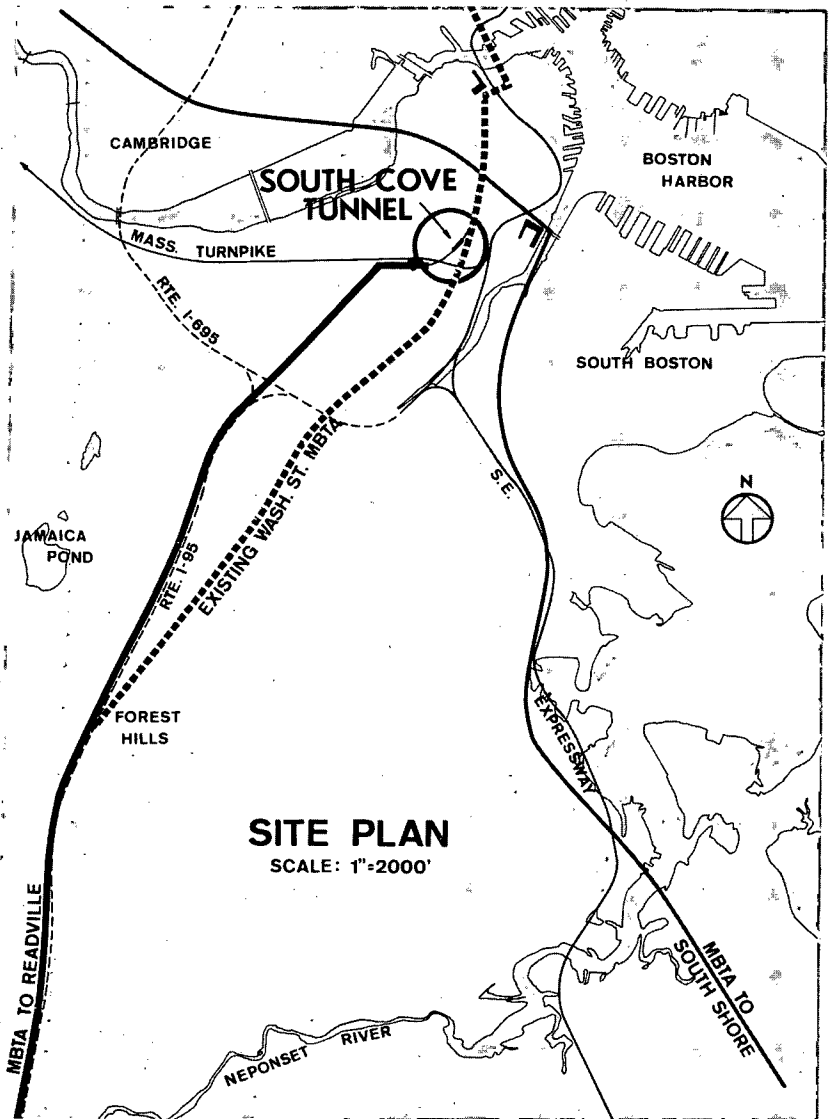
The site of the South Cove Tunnel Project — a first stage improvement to the MBTA's Southwest Corridor extension. This new line, expected to be completed by 1975, will replace and extend service between Washington Street tunnel and Forest Hills, and will allow the existing Washington Street elevated to be demolished. The new route will ultimately extend to Route 128 in Dedham.
